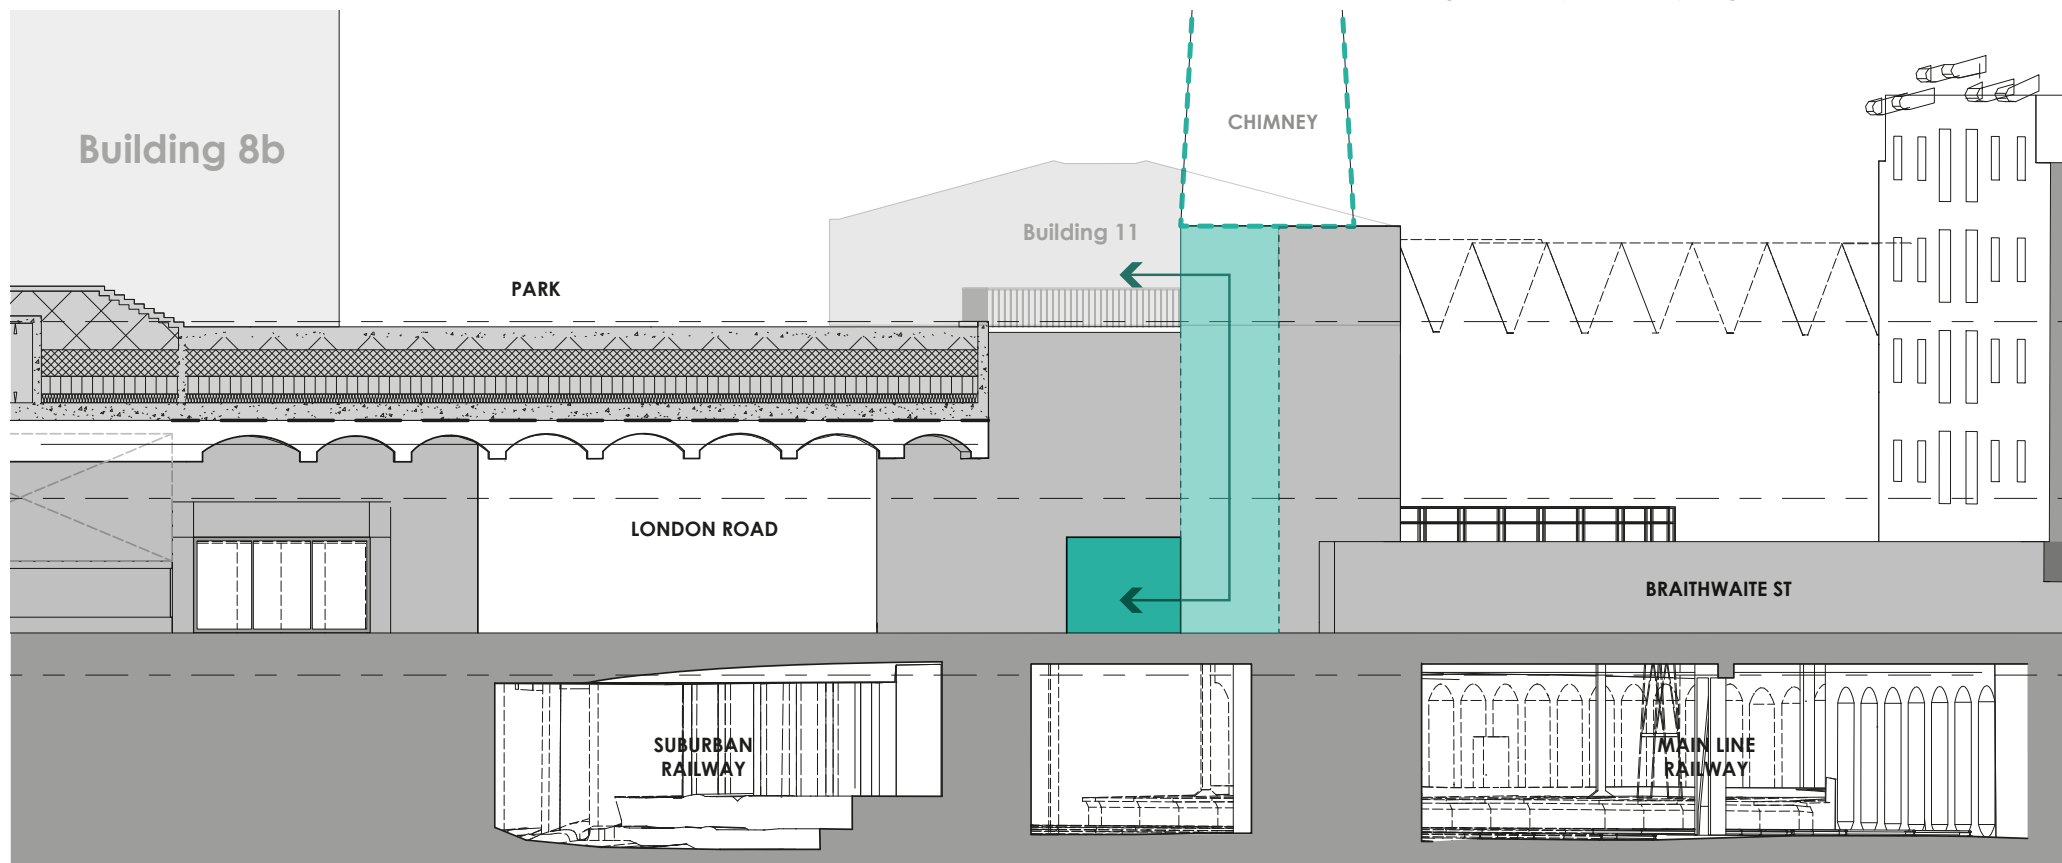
Proposed new opening - Braithwaite Street elevation
